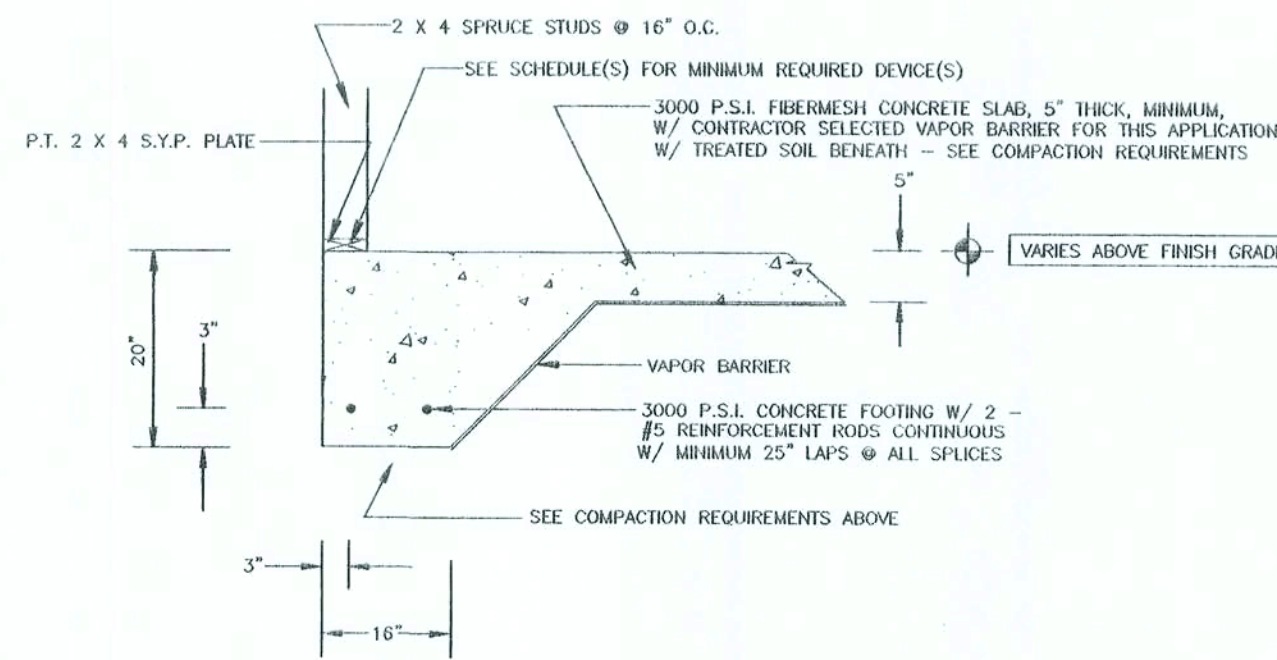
DETAIL @ EACH SIDE OF GARAGE DOOR OPENING
